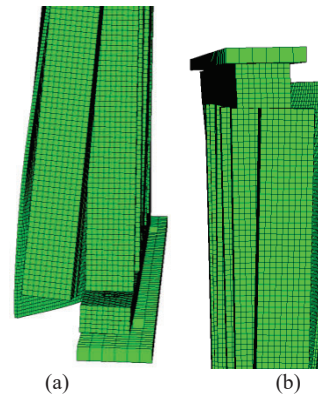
Failure of the shear wall model (Wall 4): (a) End stud separation from bottom plates, (b) End stud separation from top plates
